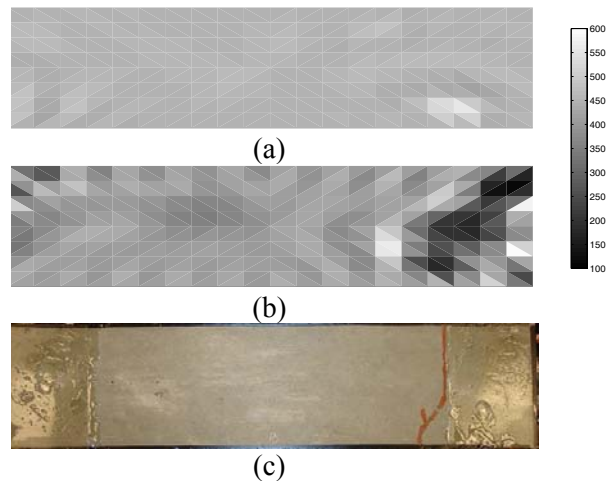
EIT images of Specimen #5: (a) prior to loading, and (b) after damage localization. (c) Damage denoted by red marking.
